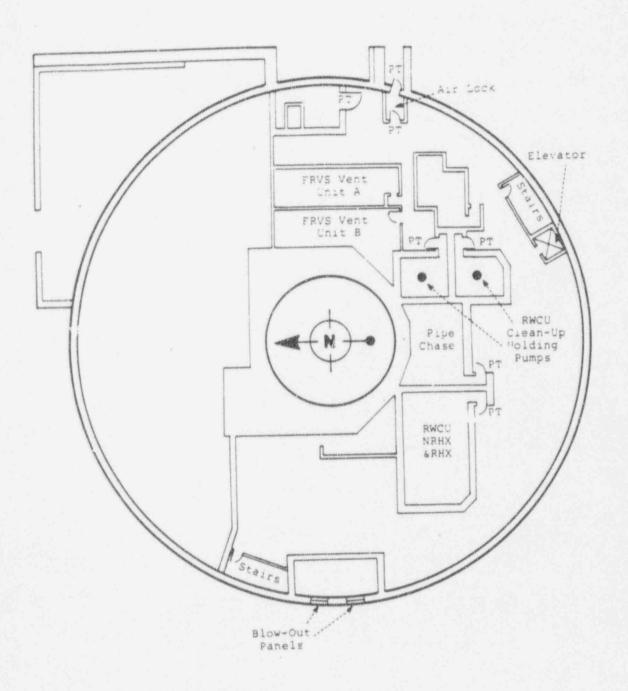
Reactor Building Enclosure Outline Plan at Elevation 145'-0"
